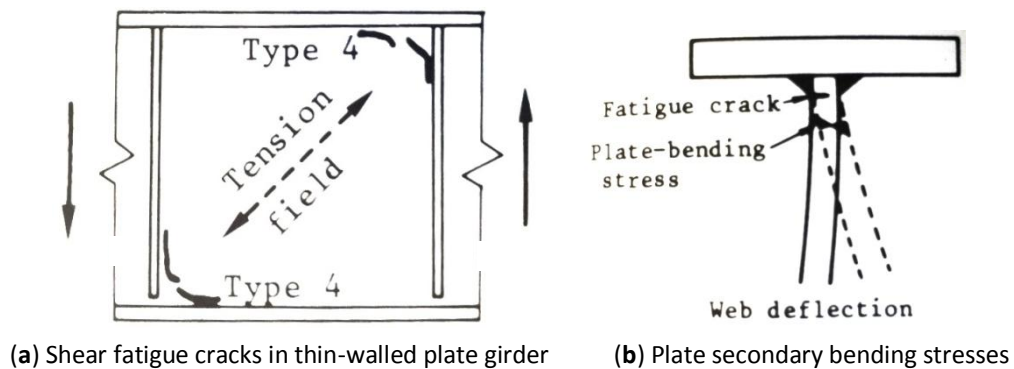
Plate girders fatigue cracks and secondary stresses, (Narayanan and Roberts, 1991).
